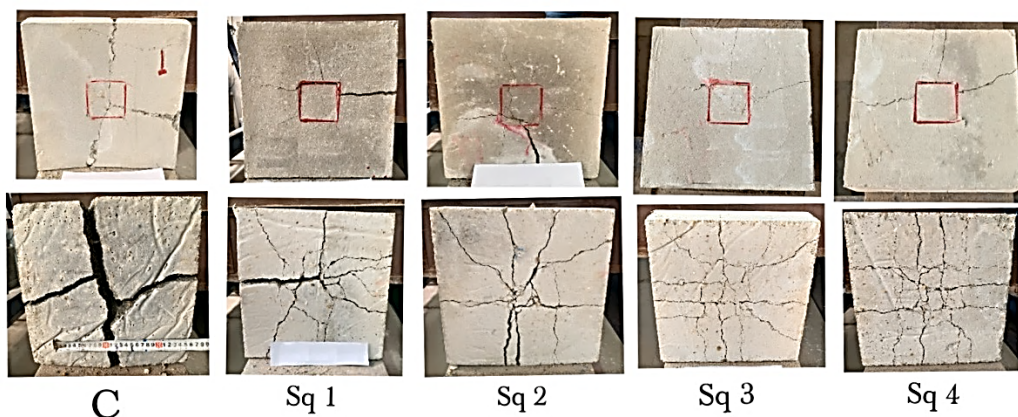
Crack Patterns Observed in Concrete Footings.
